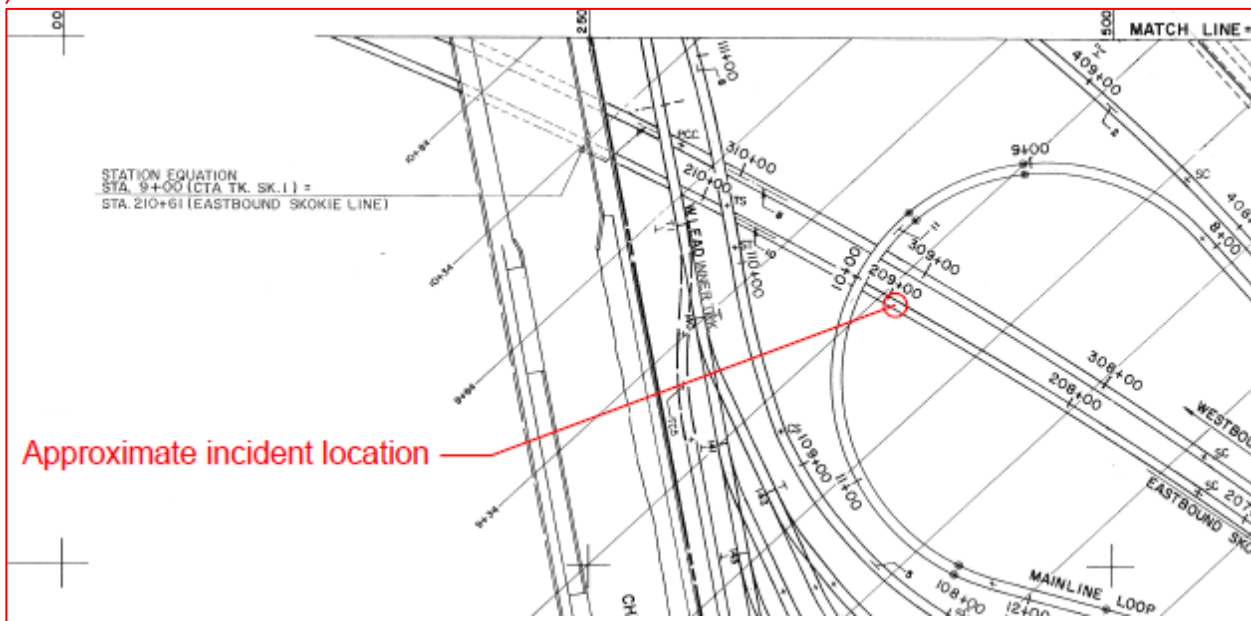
Expanded Track Plan of Howard Yard and Accident Site
